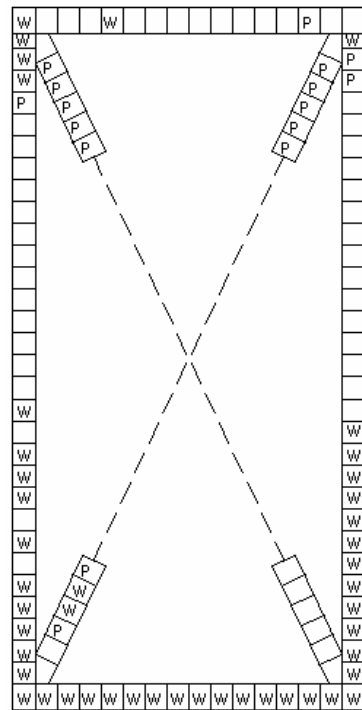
Sheathing nail failure modes for Wall A6.
